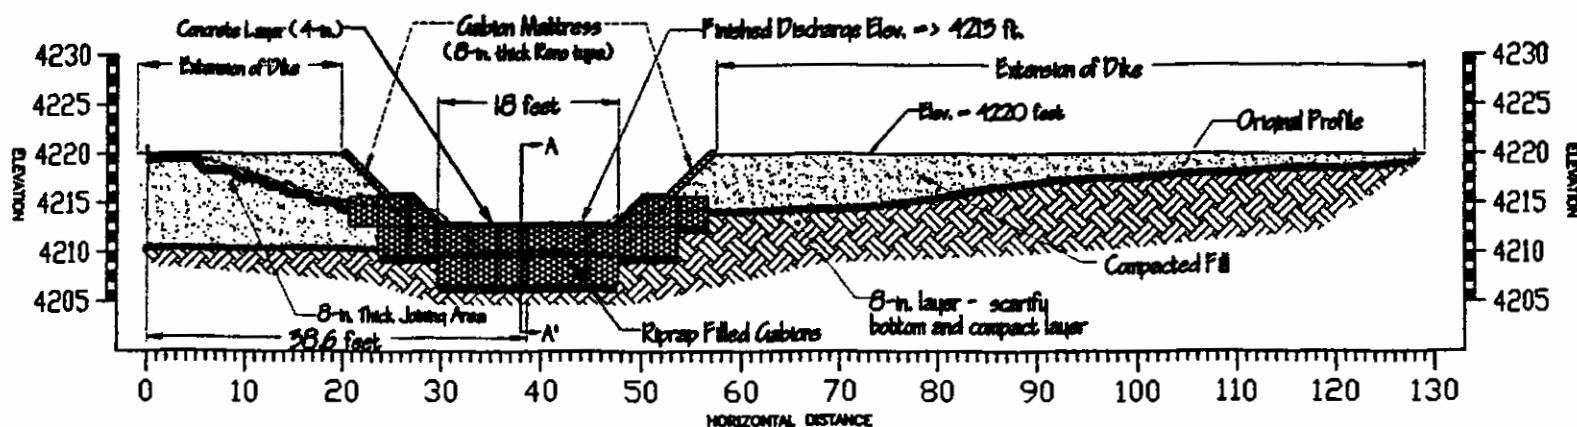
CROSS SECTION C - C' SHOWING PLACEMENT OF GABIONS
